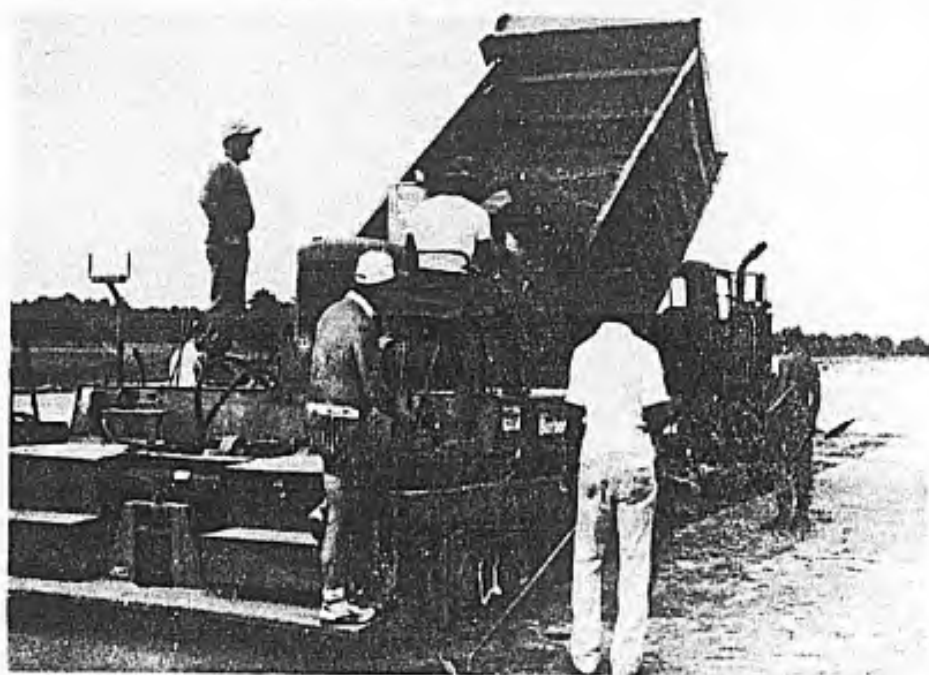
Placement of Stabilized Soil with Asphalt Spreader.
